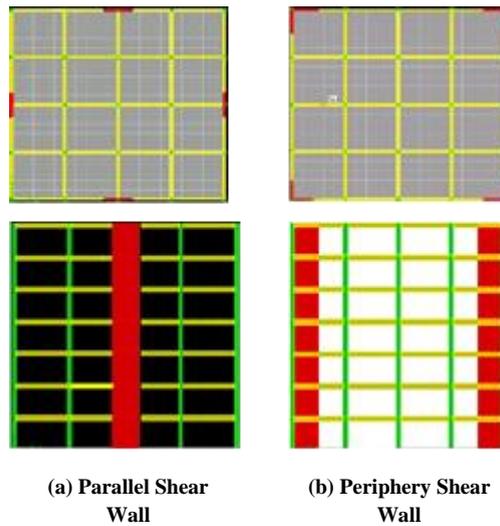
(a) Plan and elevation view for bare frame with Parallel shear wall (b) Plan and elevation view for bare frame with Periphery shear wall
